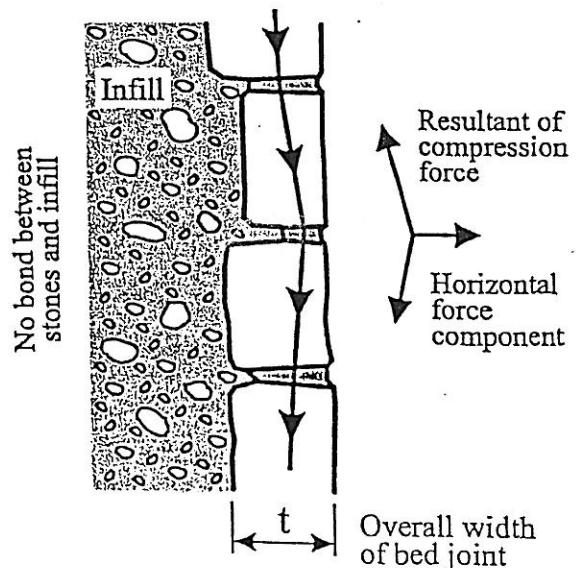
Marble Stone Facing Imperfection of bed joints.
